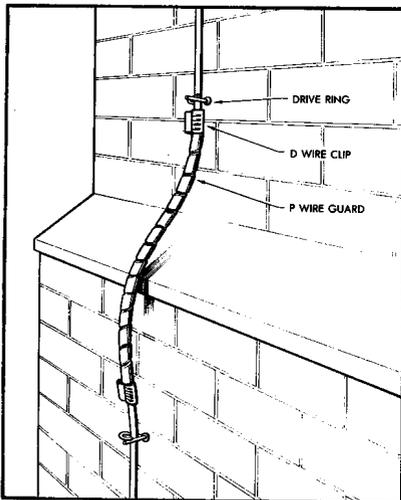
Drop Wire Crossing Masonry Building Projection
